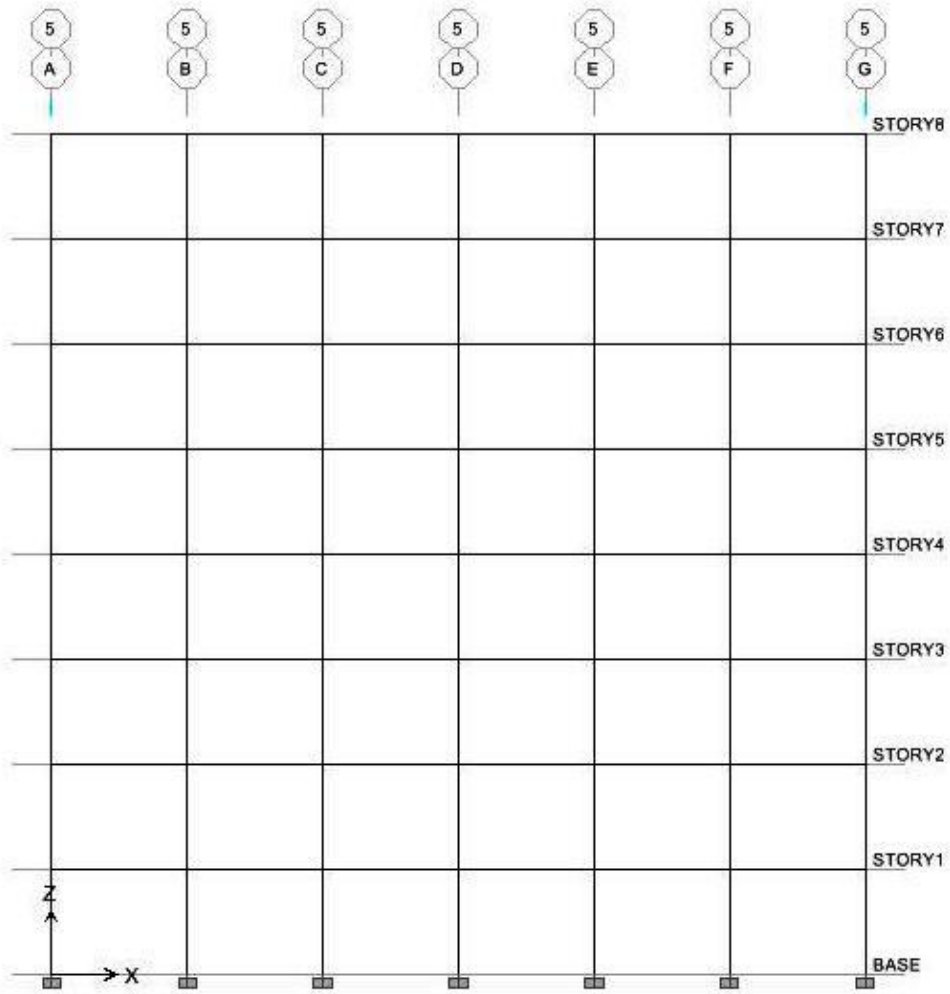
ELEVATION VIEW FOR 8 STOREY R/C FRAME BUILDING
